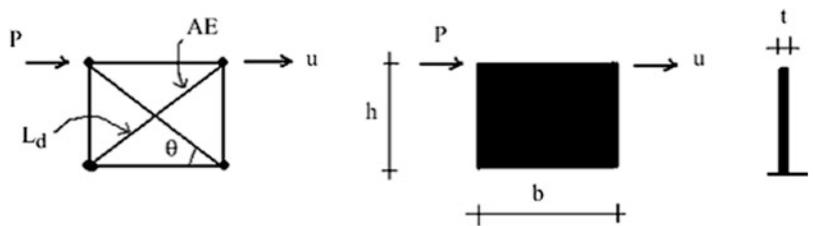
Shear stiffness elements. (a) Steel brace. (b) Concrete shear wall
